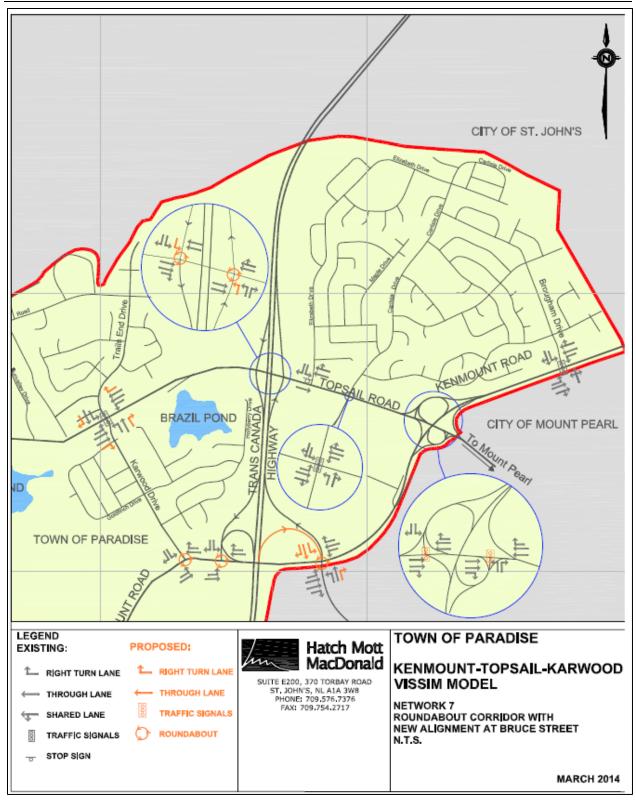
2025 Roundabout Corridor – Lane Configuration
